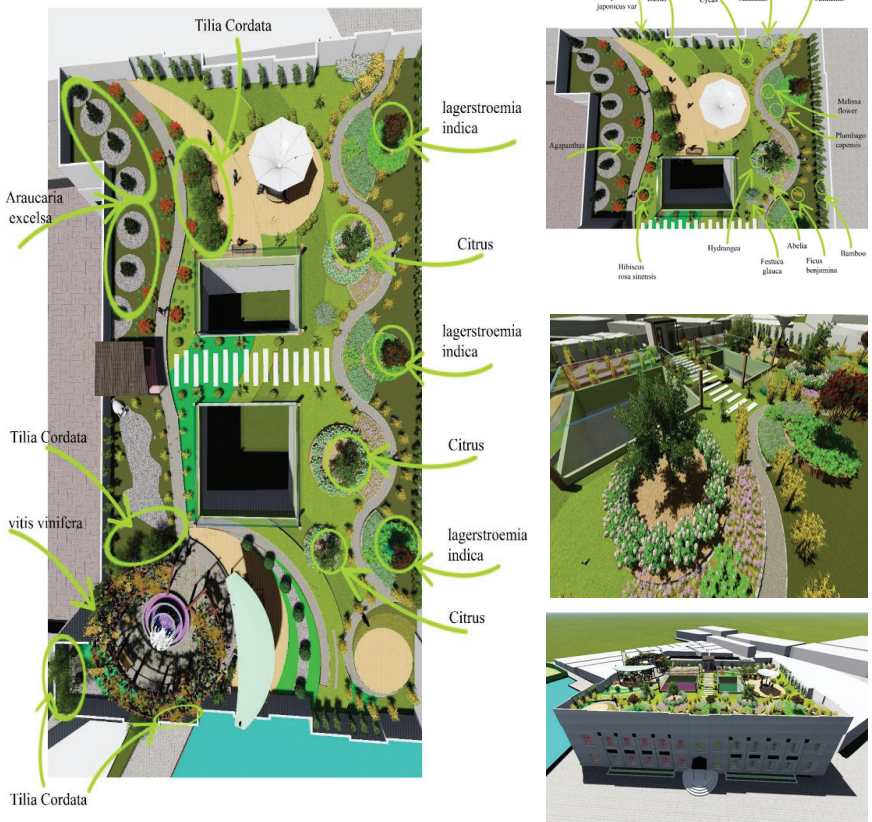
A; Tree plantation areas, B; shrub groups, C; general view of the designed roof and D; a detailed sketch from the roof.
